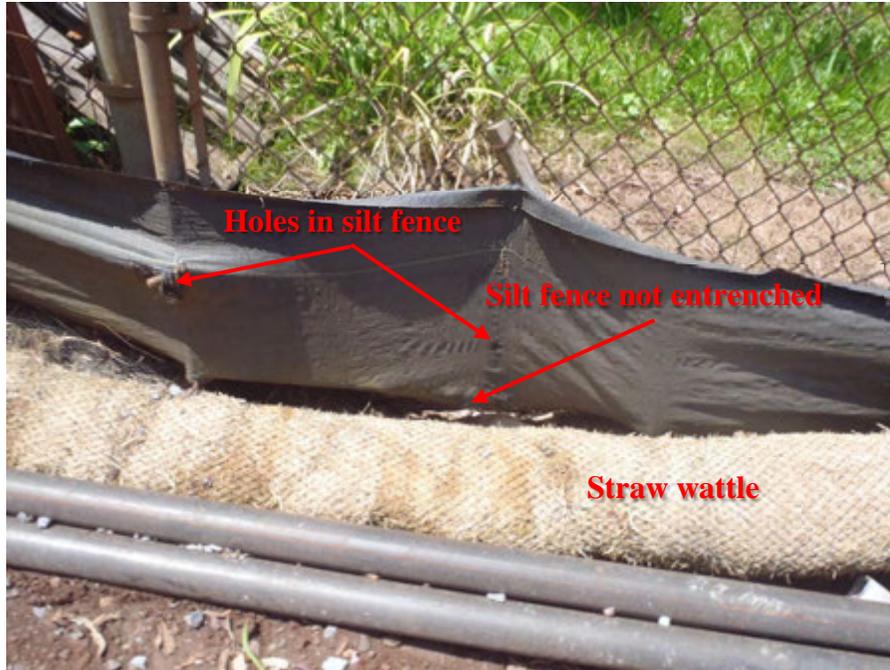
Wahiawa WWTP Construction Project – View of soil stockpile near northwest corner of the site. Note silt fence not entrenched into ground and straw wattles not entrenched or staked into ground. .
